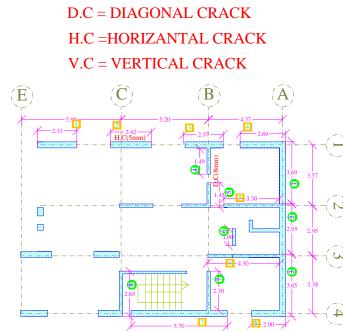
Plan of the 1<sup>st</sup> floor of the sample building, and the observed wall damages
